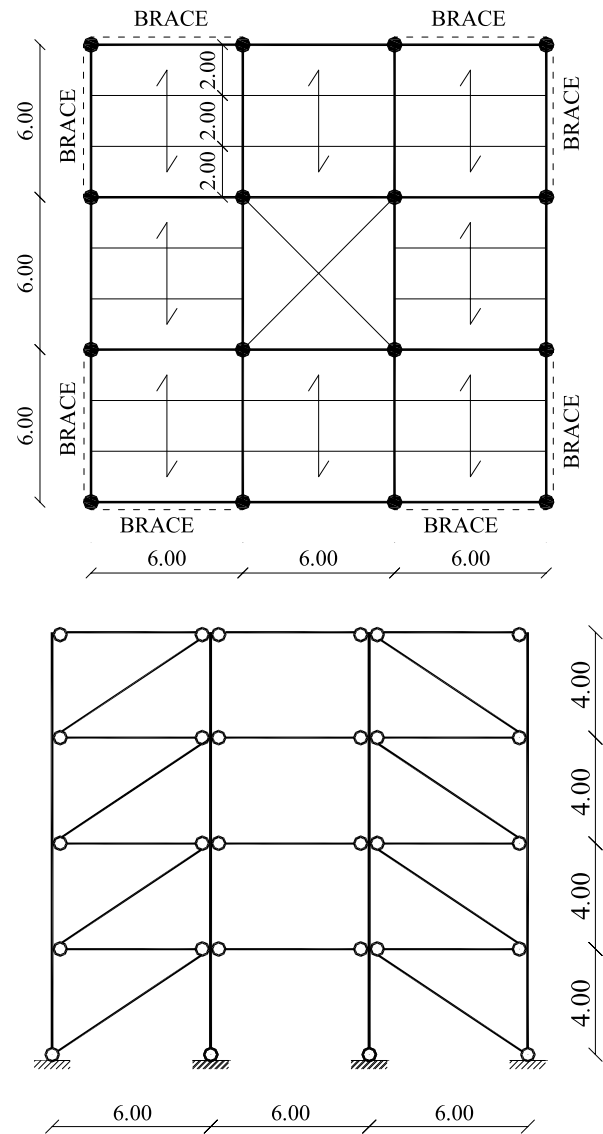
Plan configuration and structural scheme of analysed buildings.
